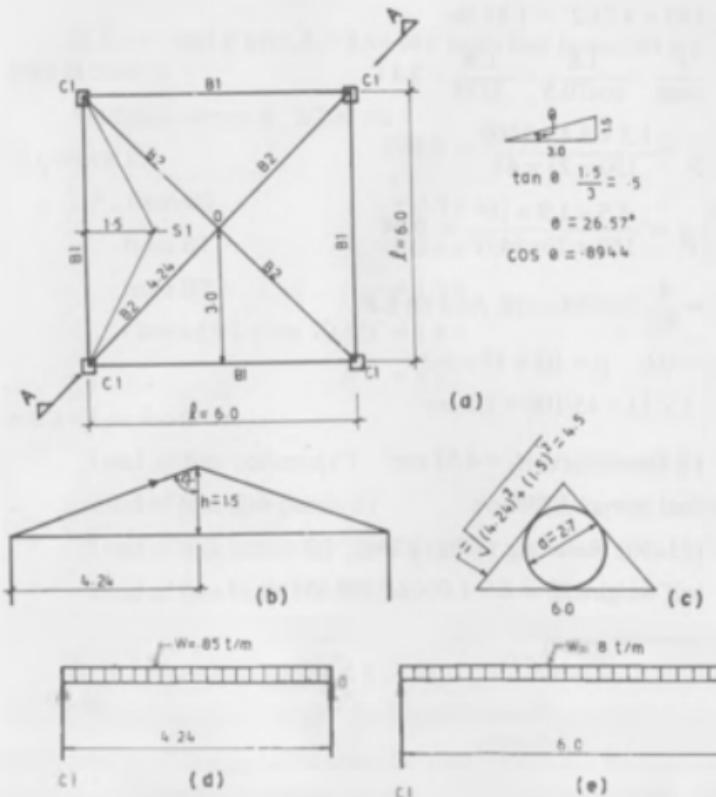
Pyramidal roof of a numerical example. (a) Plan; (b) Section A-A; (c) Diameter of inscribed circle; (d) Long section of beam B2; (e) Long section of beam B1.
